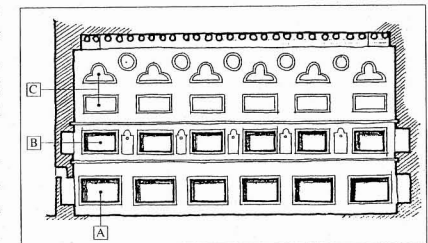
Wall Infill Elements (Salman Mattar house, east apartment, internal or niche
